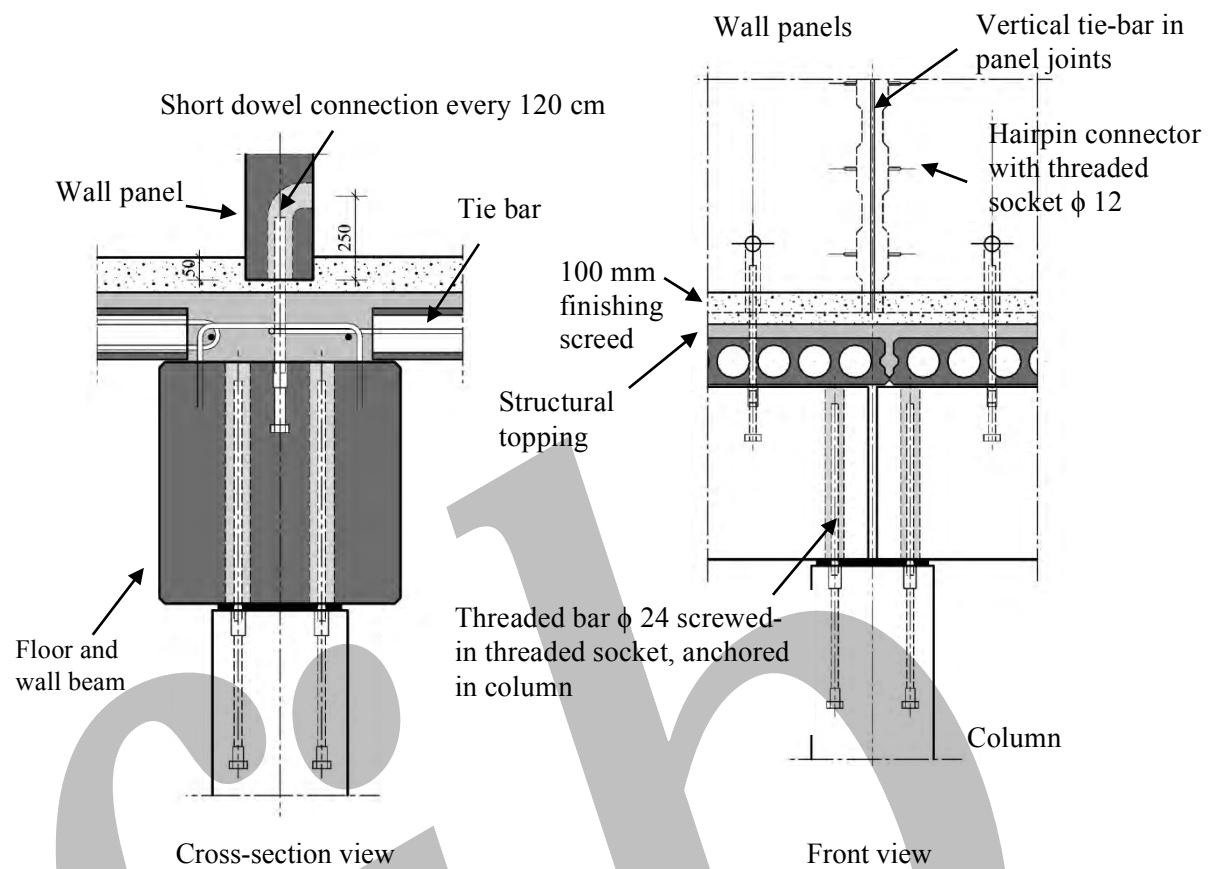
Application example of a connection between a wall panel and a supporting beam
